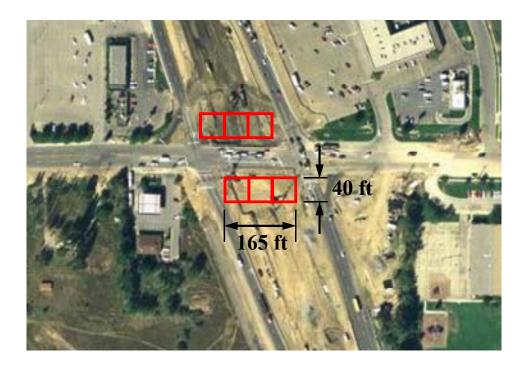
Aerial view of the Shepard Lane Bridge case history site with the approximate treatment areas outlined in red.
